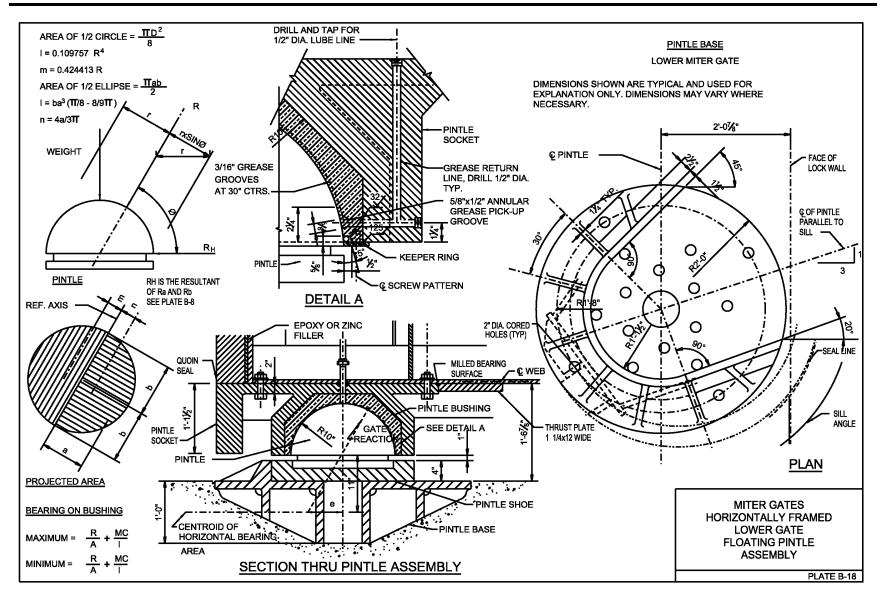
Plate 18: Miter gates, horizontally framed lower gate, floating pintle assembly
